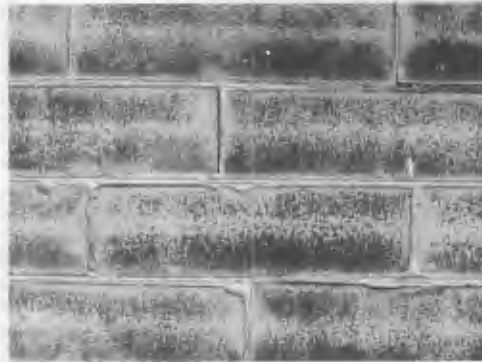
This stone garden wall was tuckpointed to match the tuckpointing on the c. 1920s house on the property. Photo: Anne Grimmer.
